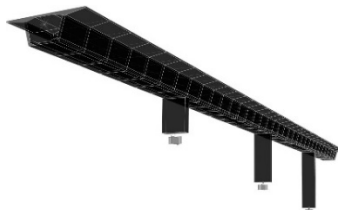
3D render model of RC girder bridge with rebar layout in piers
